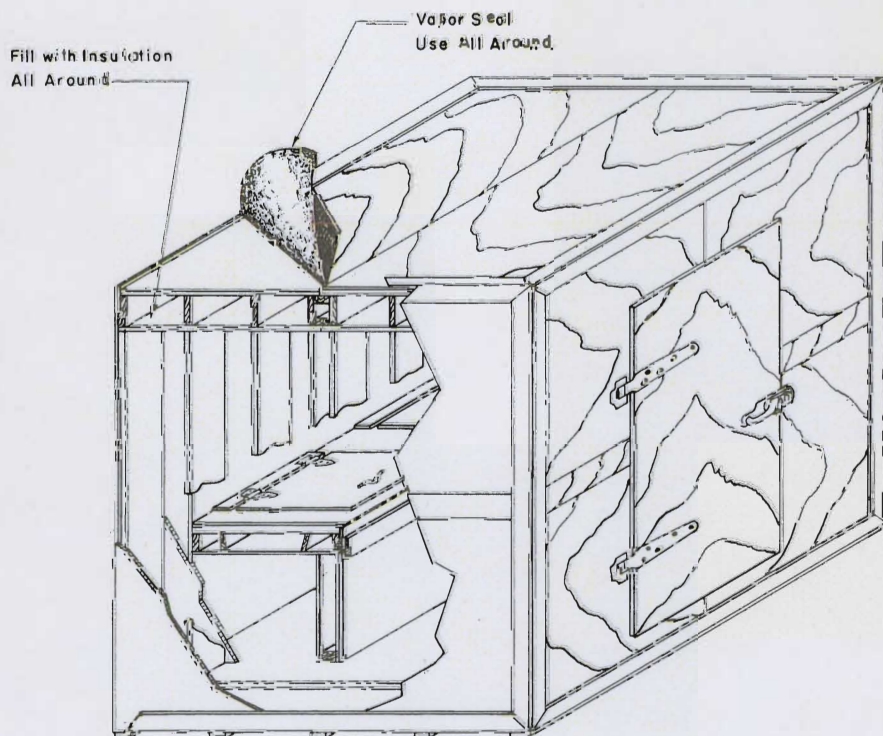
Cutaway view of the home cooler built at University Farm, showing the cooler room with freezer box.
